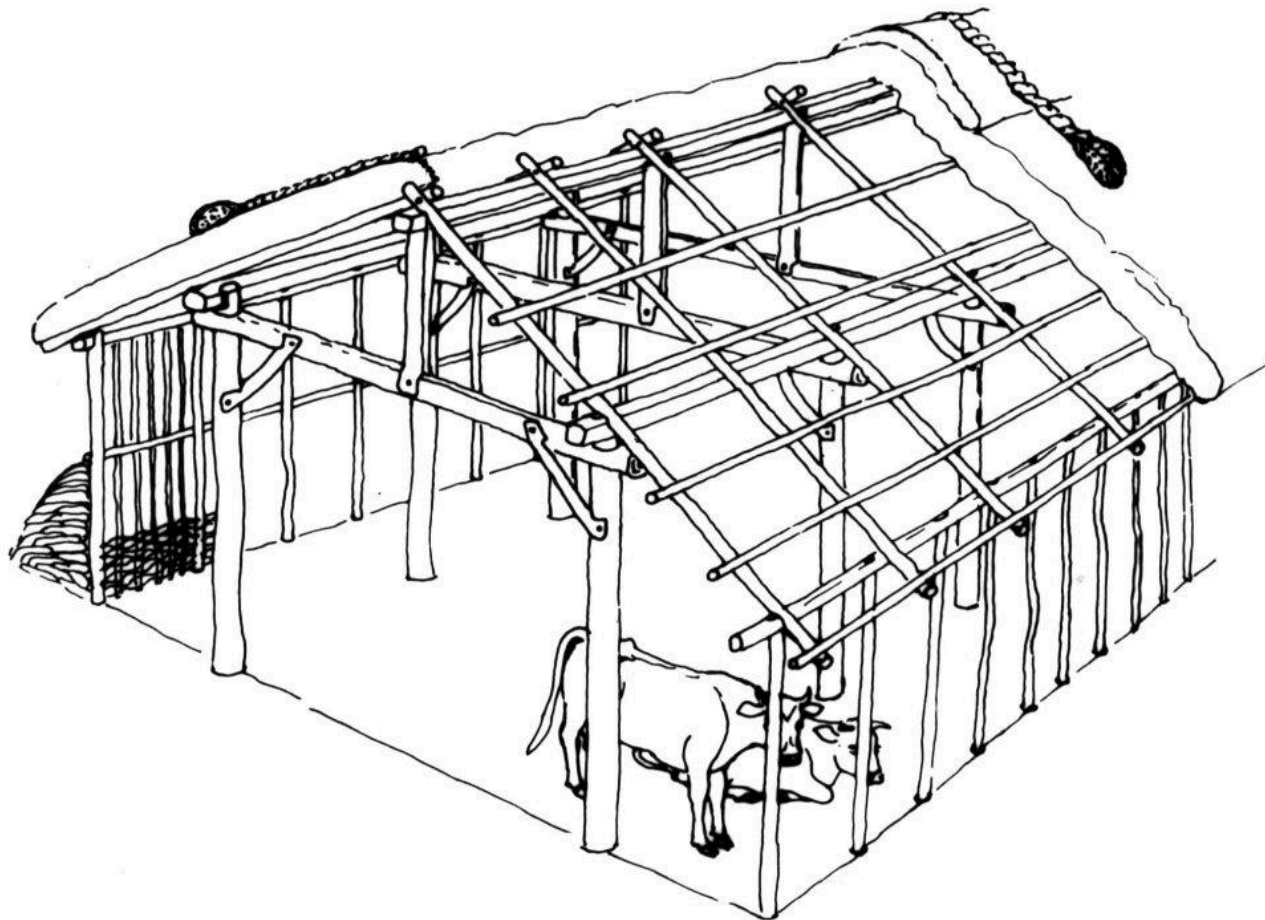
RECONSTRUCTED ELEVATION OF THE BYRE OF AN EARLY IRON AGE HOUSE (AFTER STEENBERG 1974)
